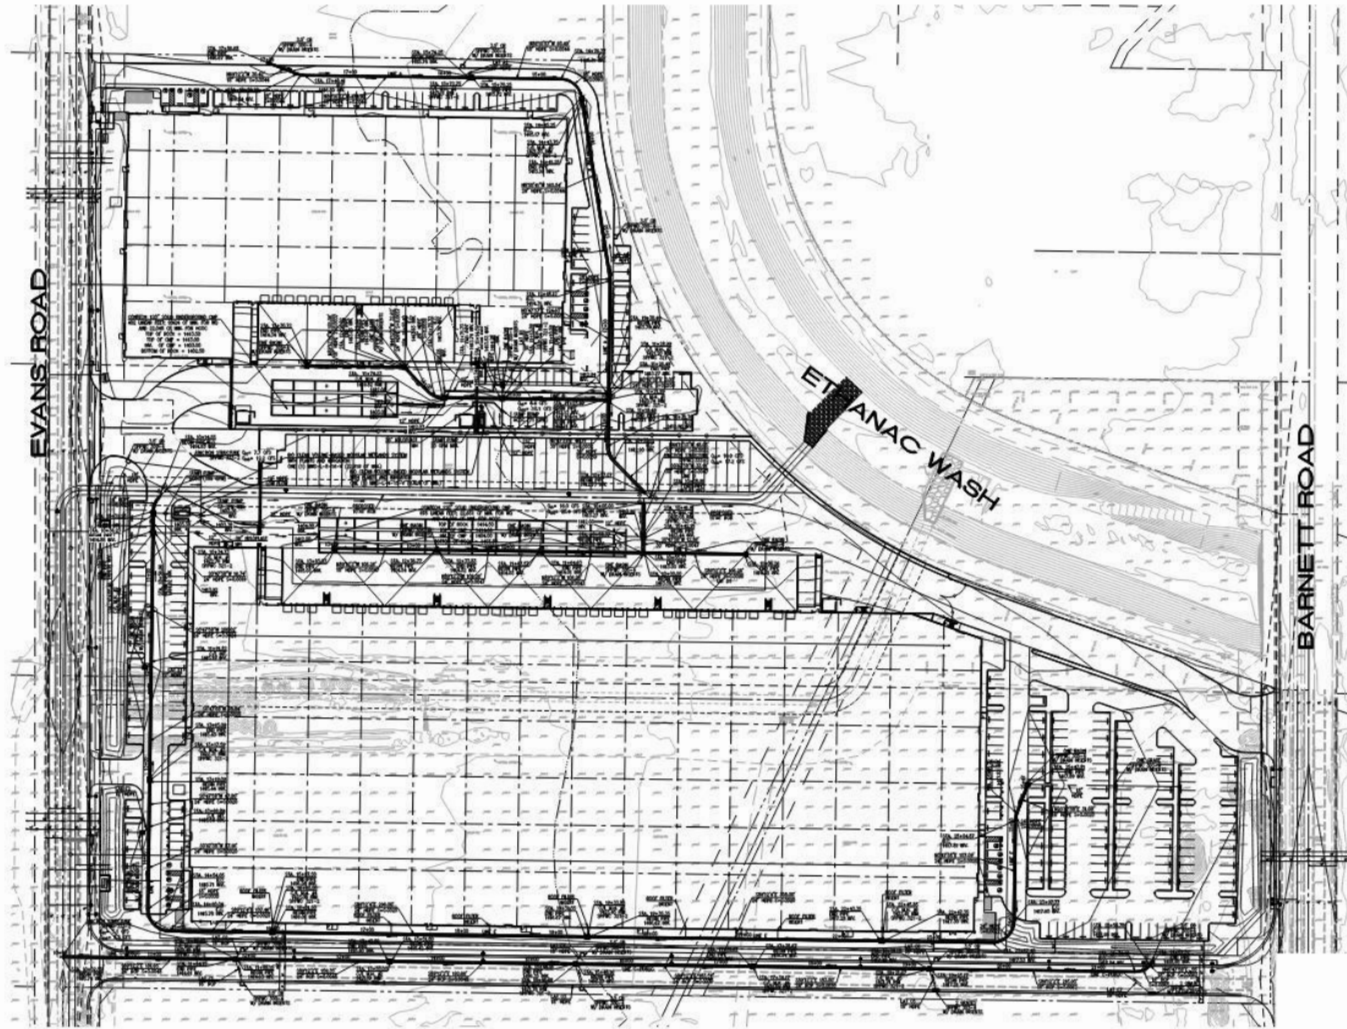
Conceptual Storm Drain Plan for that illustrates the Project's proposed drainage improvements and relocated Line A-8.
